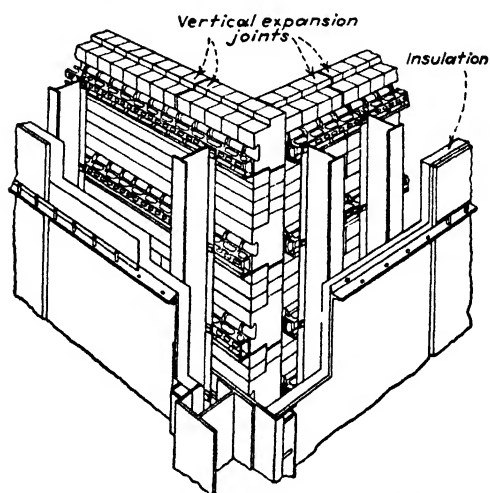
Air-cooled, sectionally supported wall (Reintjes).
